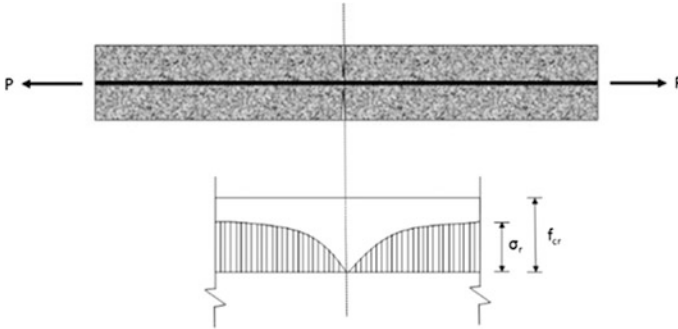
Distribution of concrete stress after cracking (adapted from Koon and Hoon [11])
